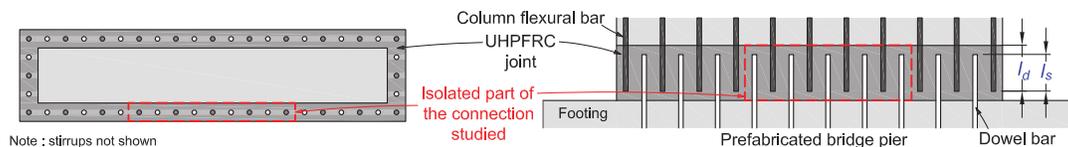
Typical detail for UHPFRC with noncontact lap splice
